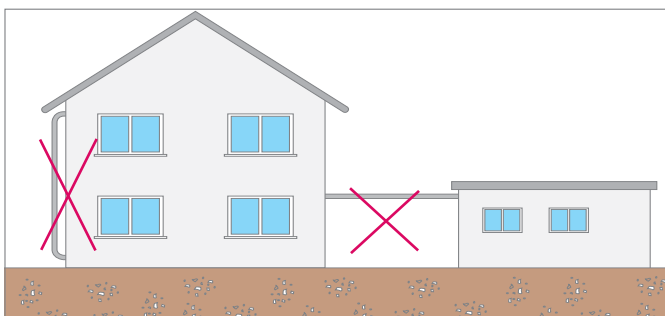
All external installations, in-ground and above ground, to be adequately protected
